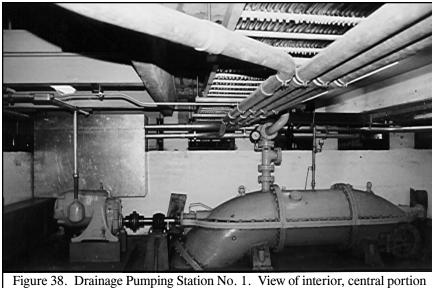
Drainage Pumping Station No. 1. View of interior, central portion of building, showing 30" Wood constant duty screw pump.
